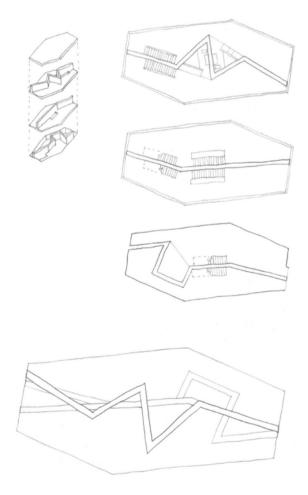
Drawings of Christian Kerez's House with One Wall. Drawn by Adam Sharr.
